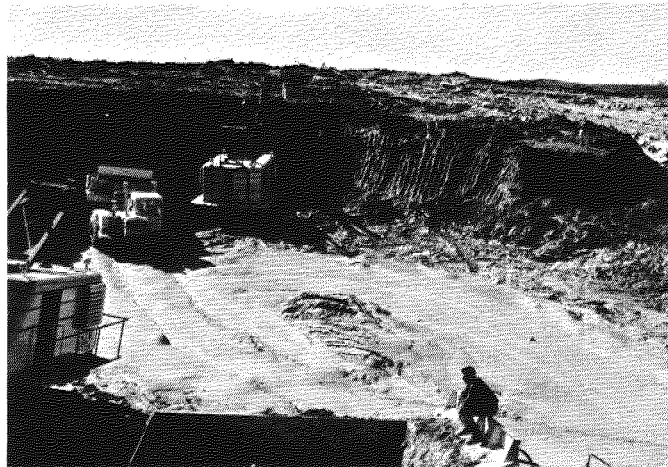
Sluiceway excavation through overburden containing permafrost, August 1957
